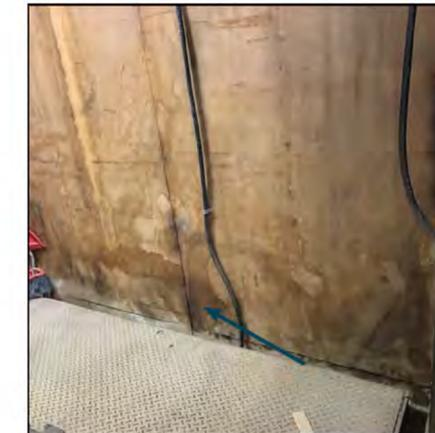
Water Staining, West Wall, Second Level Penthouse Above Fitness Center
